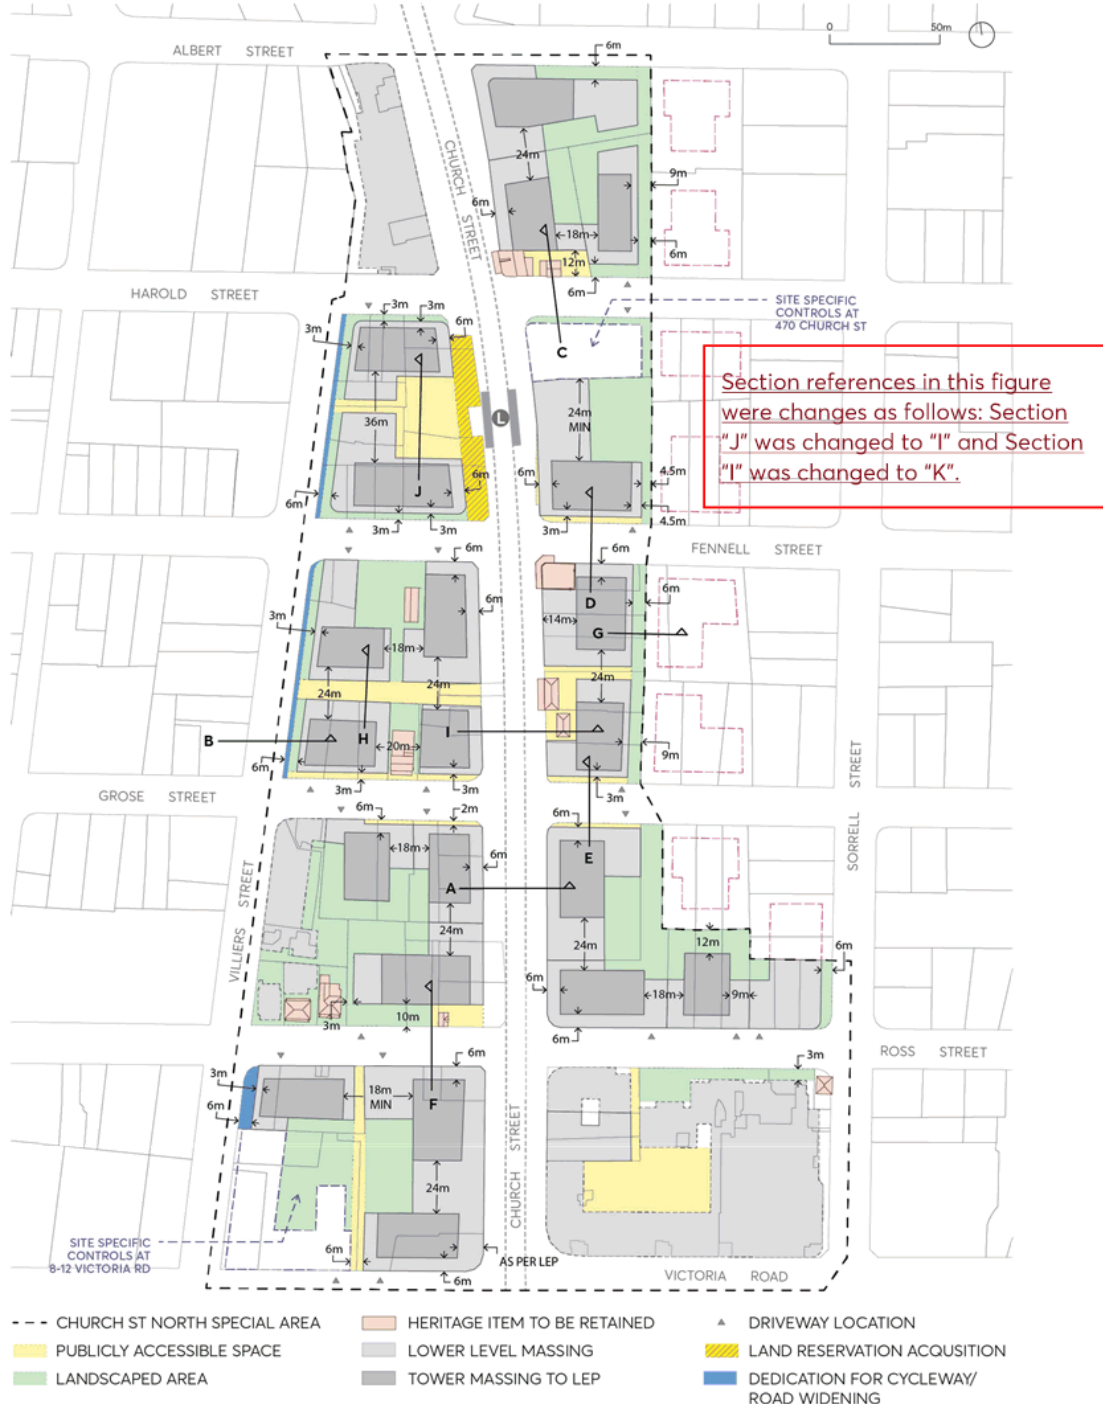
Church Street North Special Area Building Setbacks
